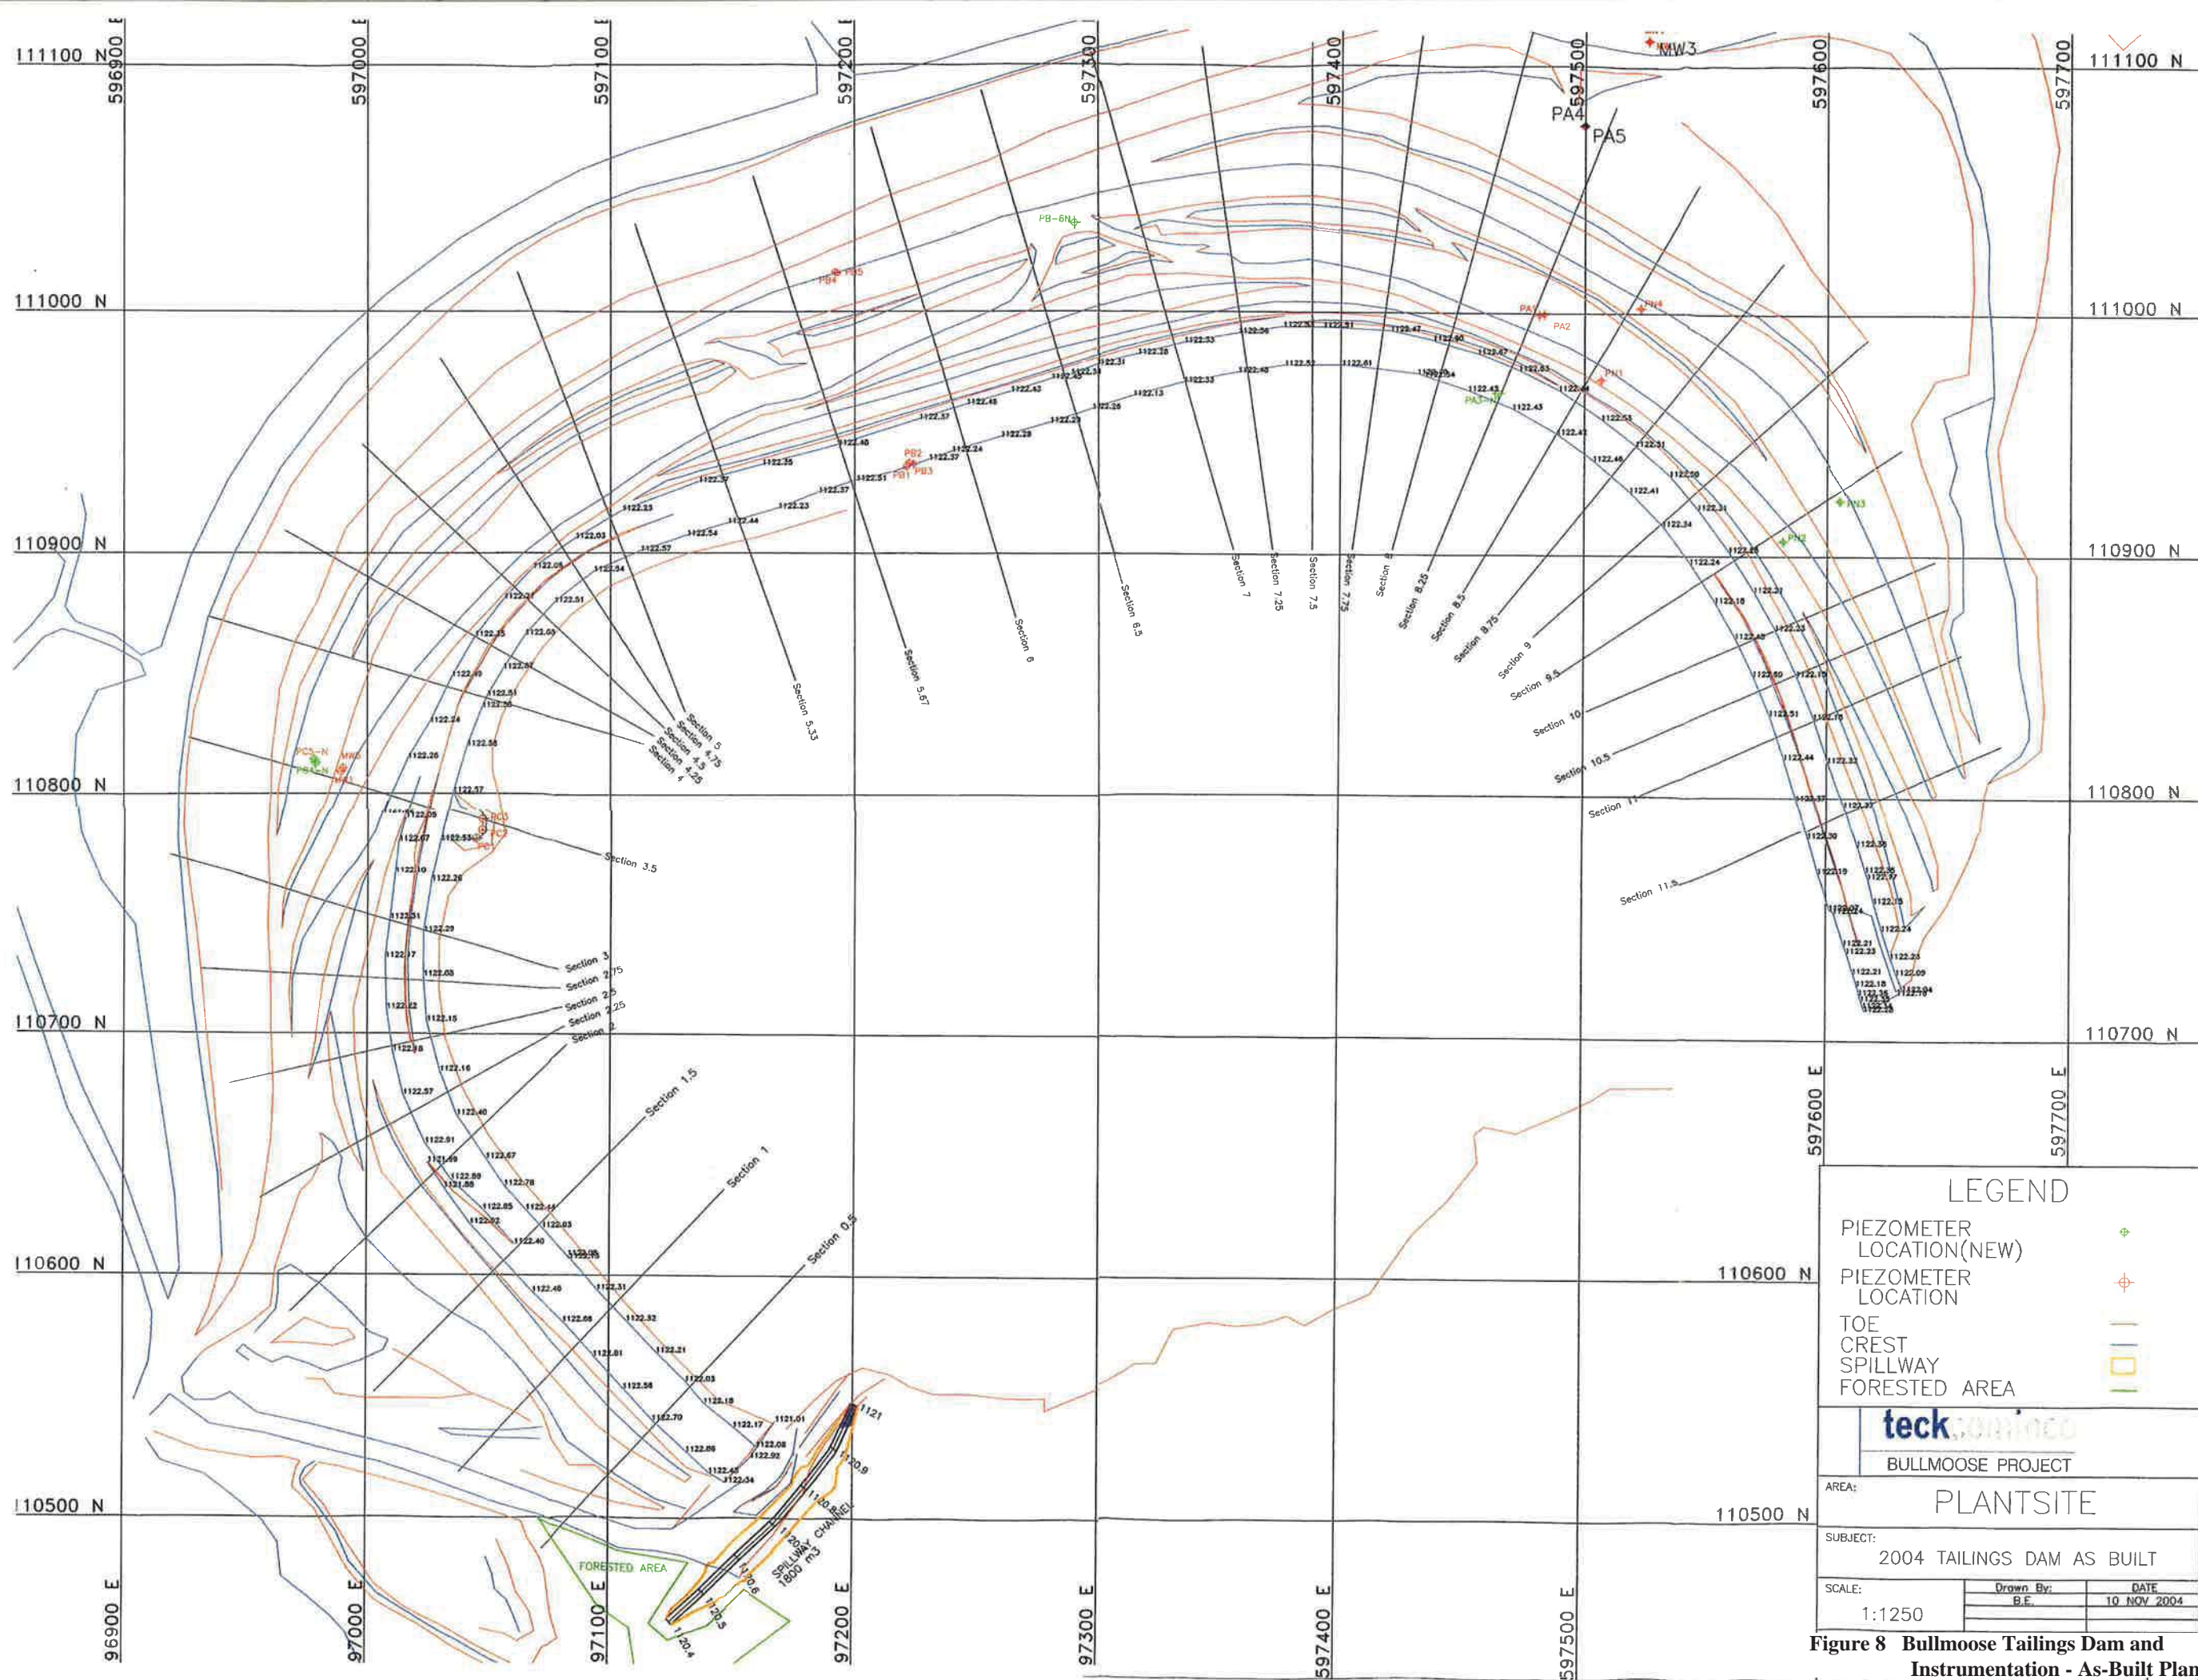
Bullmoose Tailings Dam and Instrumentation - As-Built Plan
